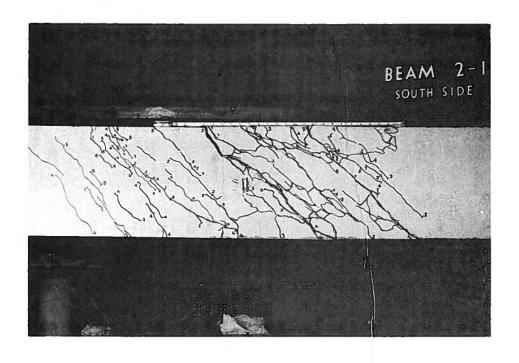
6 CRACK PATTERN OF BEAM 2 - 1
